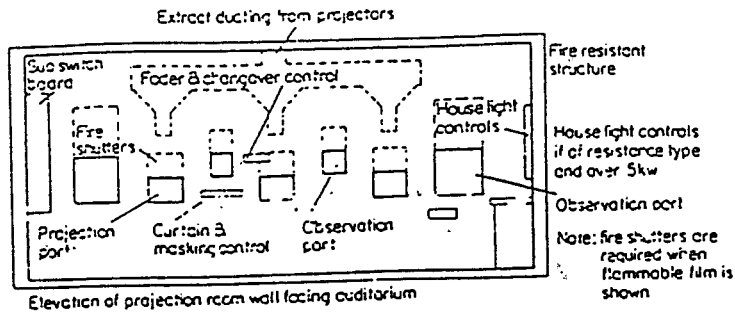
Typical arrangement of control rooms and lighting galleries
